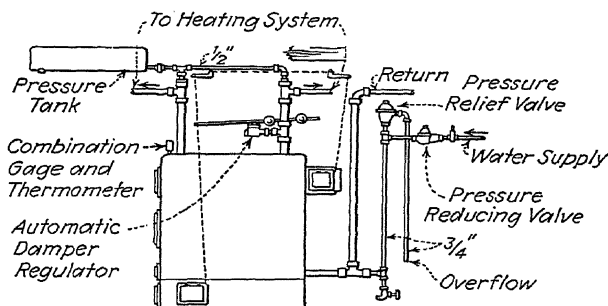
Hot-water boiler with pressure-relief valve instead of expansion tank.
